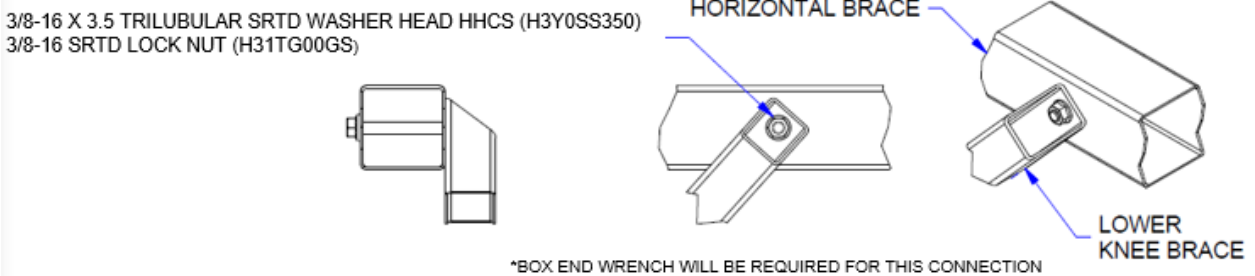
Knee Brace to Brace Deck Support Connection
